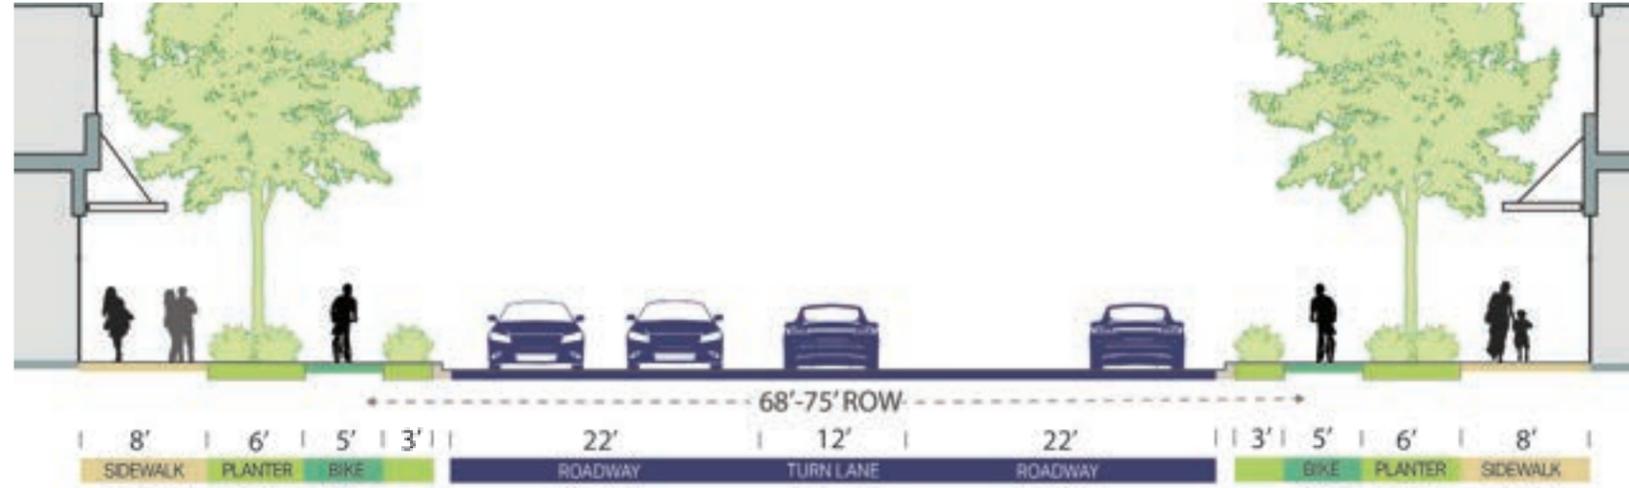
Imagery depicting Langston Boulevard Typical Cross sections
